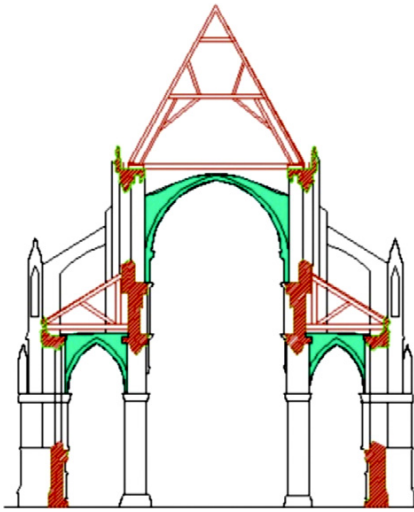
The cross section of the vault displays how the stone walls and buttresses horizontally support the nave vaults. The settlement of the buttresses pulls the walls outward, causing separation between the walls and vaults.
